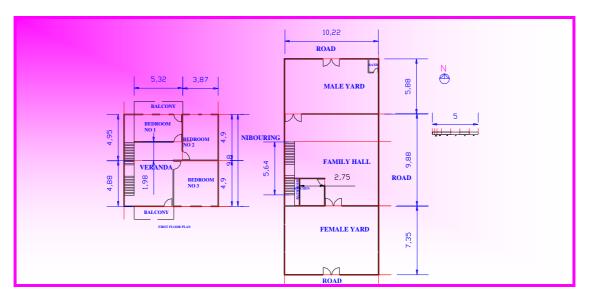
Ommer Suleiman house ground floor & first floor plan(Source: Author)
